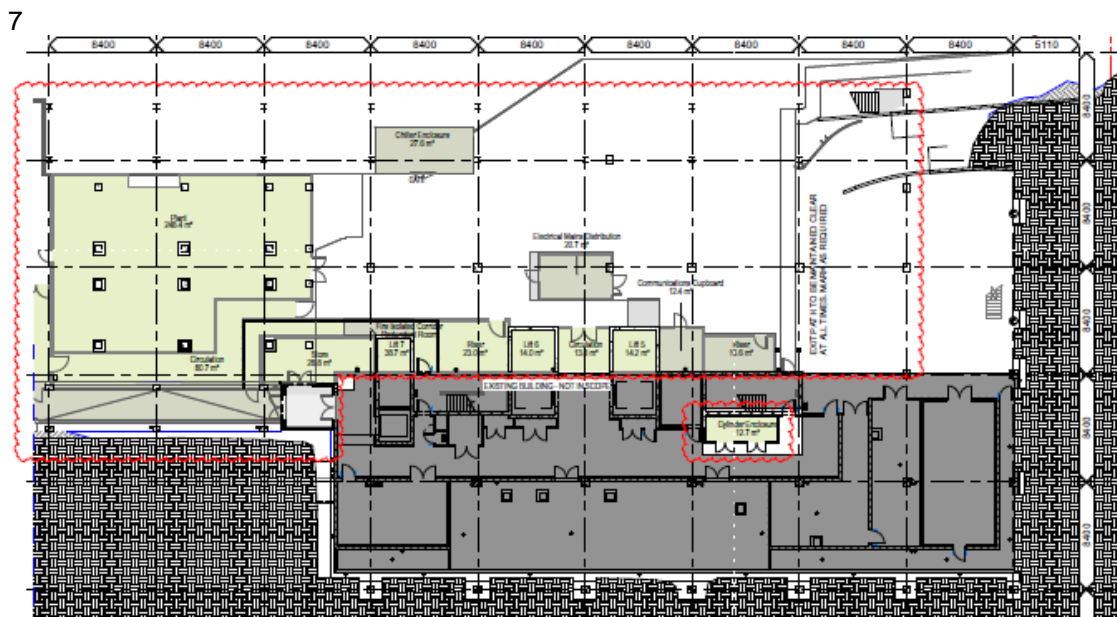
Proposed amended L03 Floor Plan (Source: Conrad Gargett)
